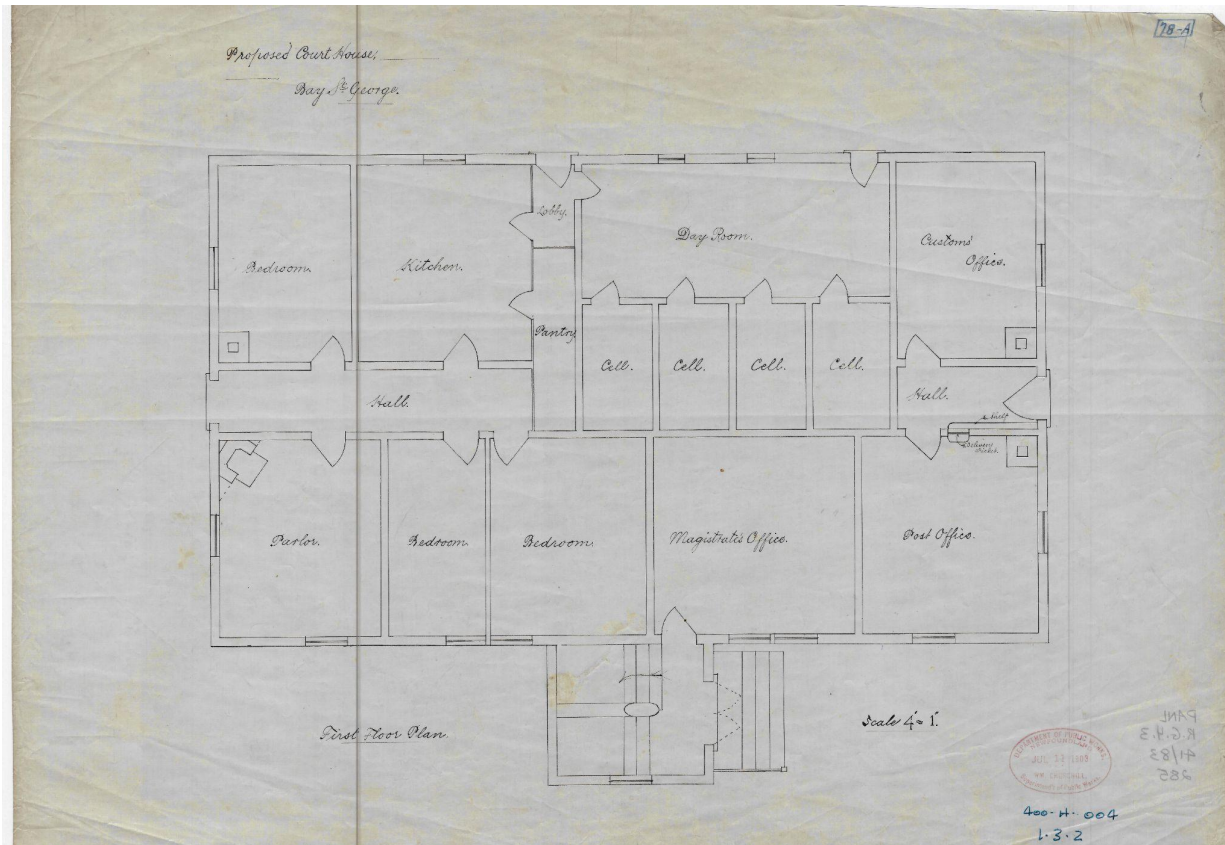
Building plan of first floor (Provided by The Rooms Archives)
